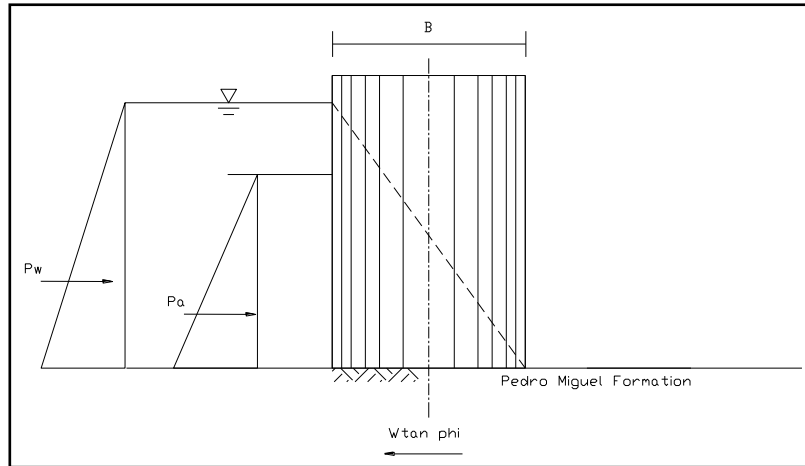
Horizontal pressure components acting on the cofferdam during the construction stage (static loading)
